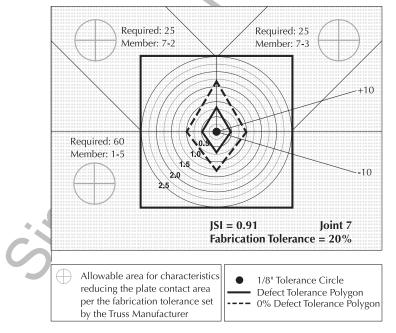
Example of a Joint QC Detail and Fabrication Tolerance Polygons.
